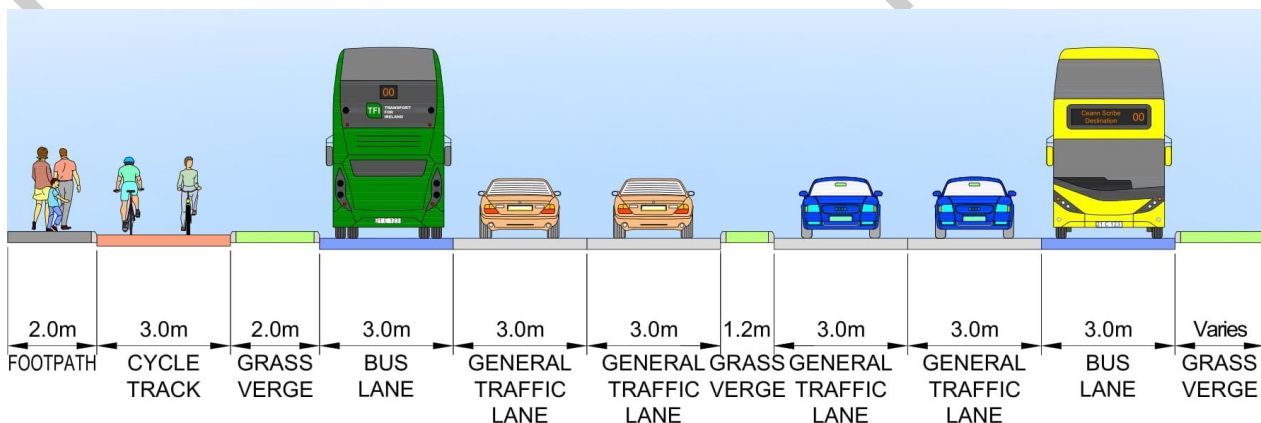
Section 2, Proposed Option 1 – Cross Section A-A
